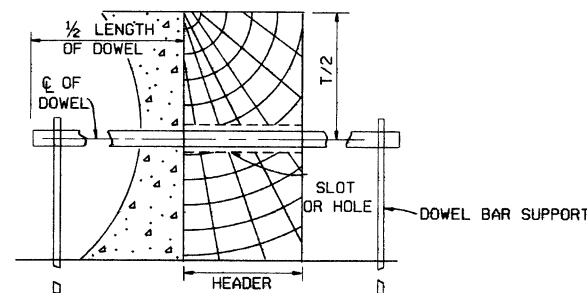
DETAIL OF JOINT SUPPORT FOR EXPANSION JOINTS
